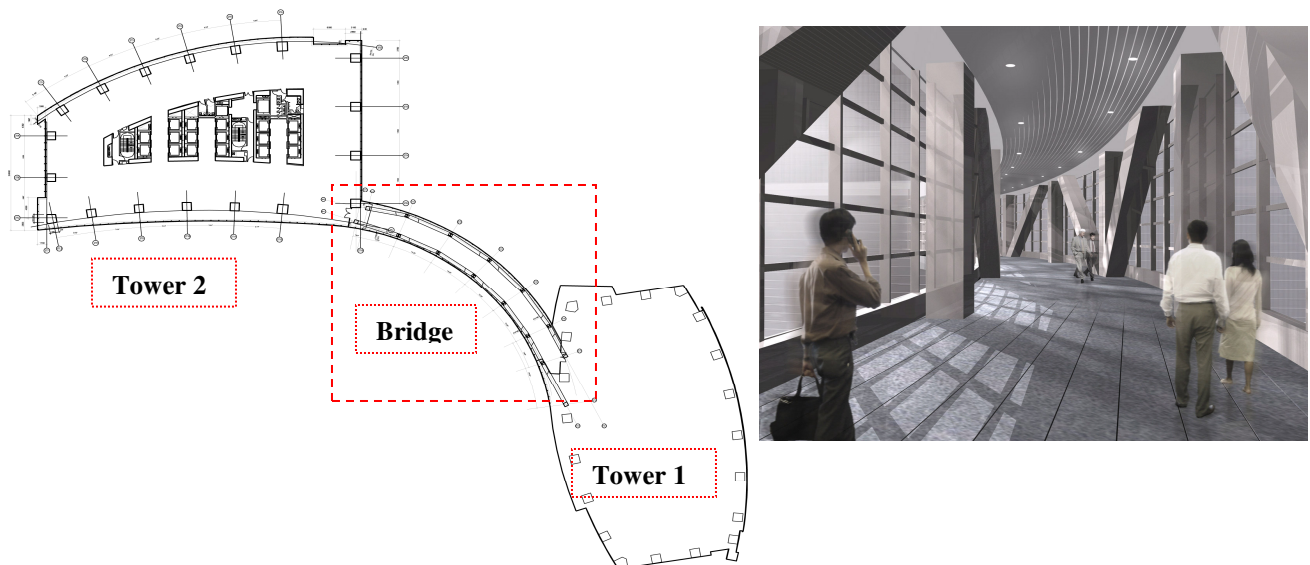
BRIDGE PLAN AND INTERIOR IMAGE
